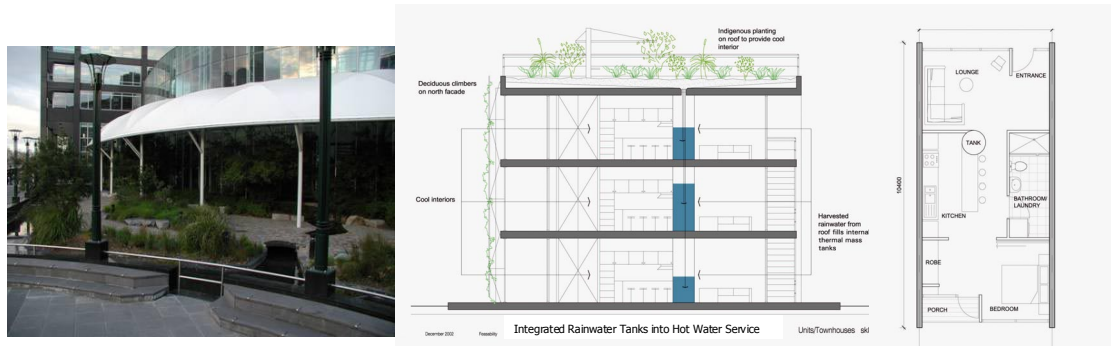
Integrating stormwater management systems into buildings – proposed rainwater harvesting from roof top garden and storage within apartments for hot-water (Landcom, Sydney)
